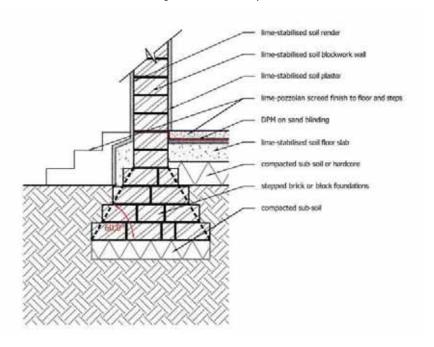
Foundation Option 2: Stepped Block, Brick or Stone Foundations
